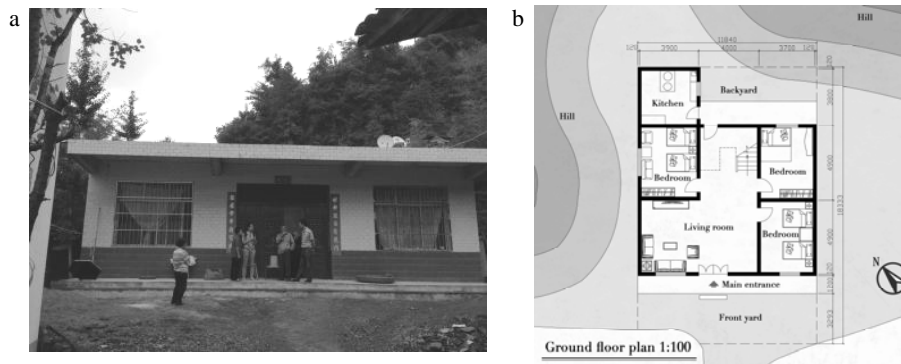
A typical contemporary rural house in the south Qinba mountainous region in west China
